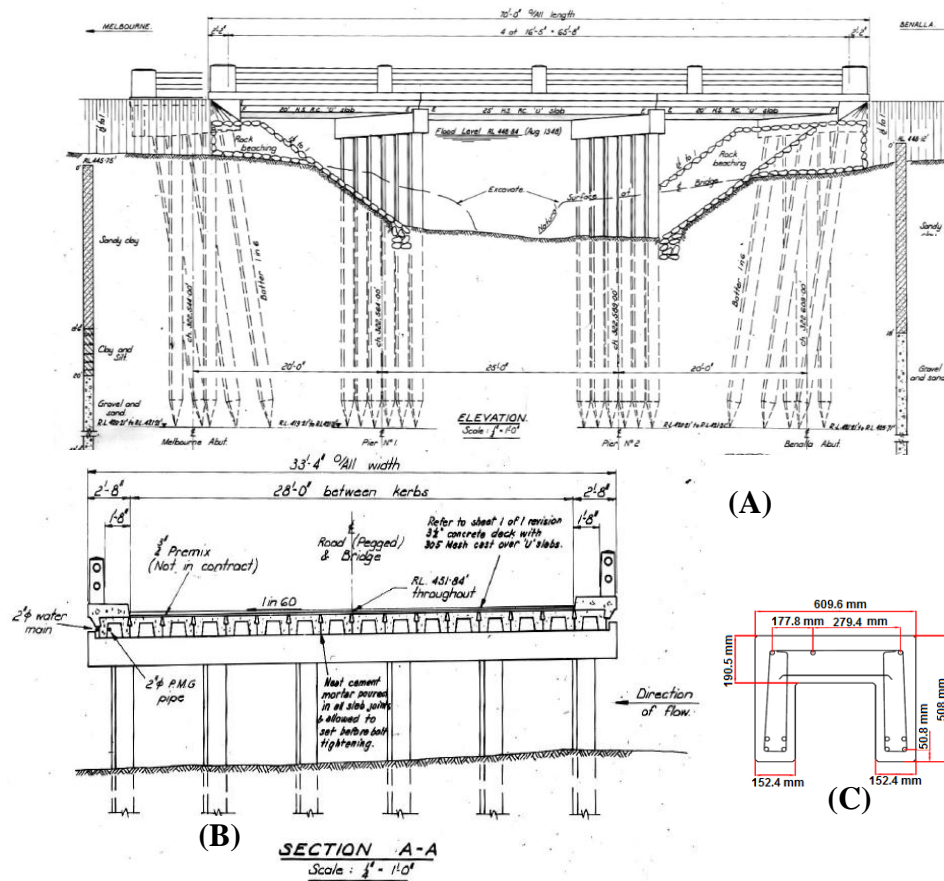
(A) Typical U-slab Bridge in Melbourne, (B) the bridge section and (C) the deck elements cross-sectional detail
